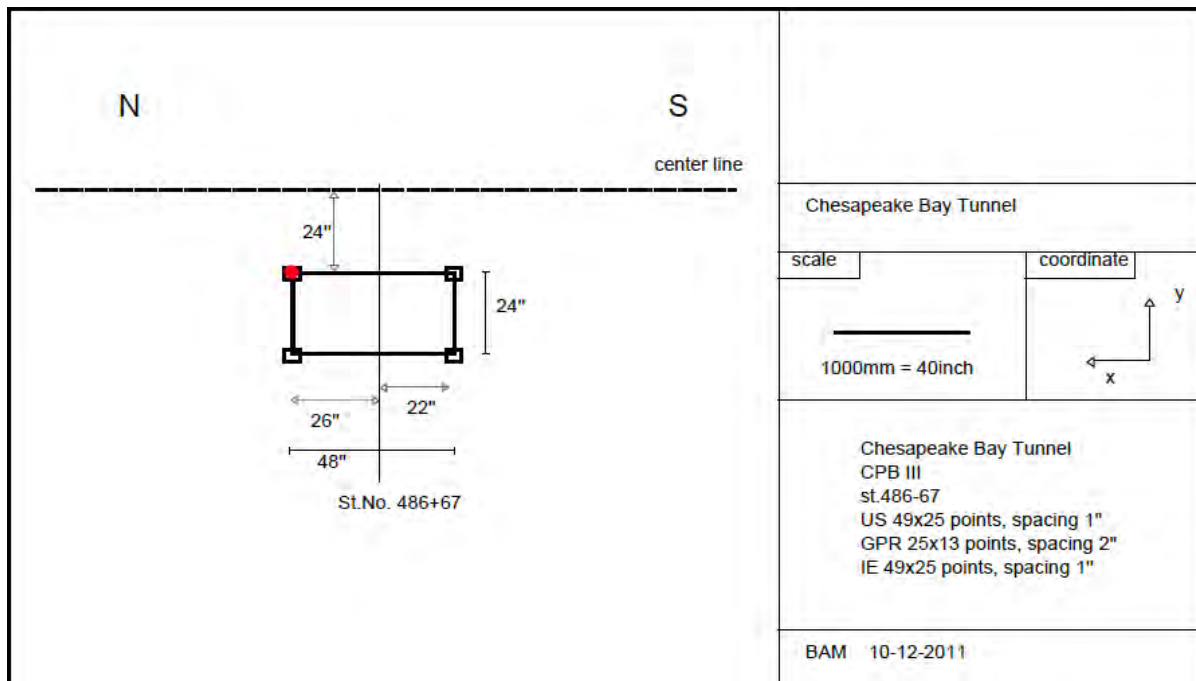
Sketch of CPB3, Sta. 486+67 Chesapeake Bay Tunnel
